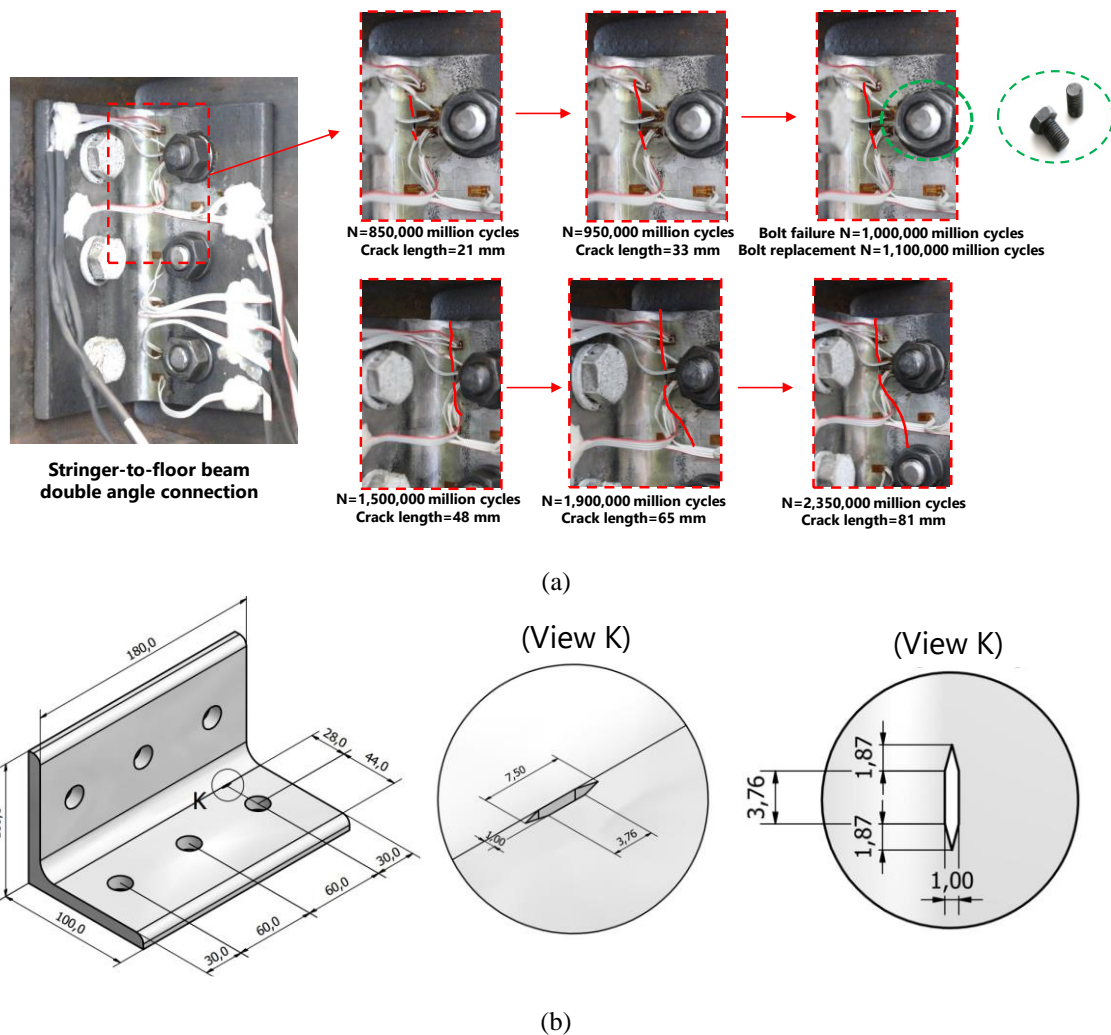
(a) Fatigue crack propagation in stringer-to-floor beam double-angle connection; (b) The geometry of notch cut at the top of the connection, units are in mm.
